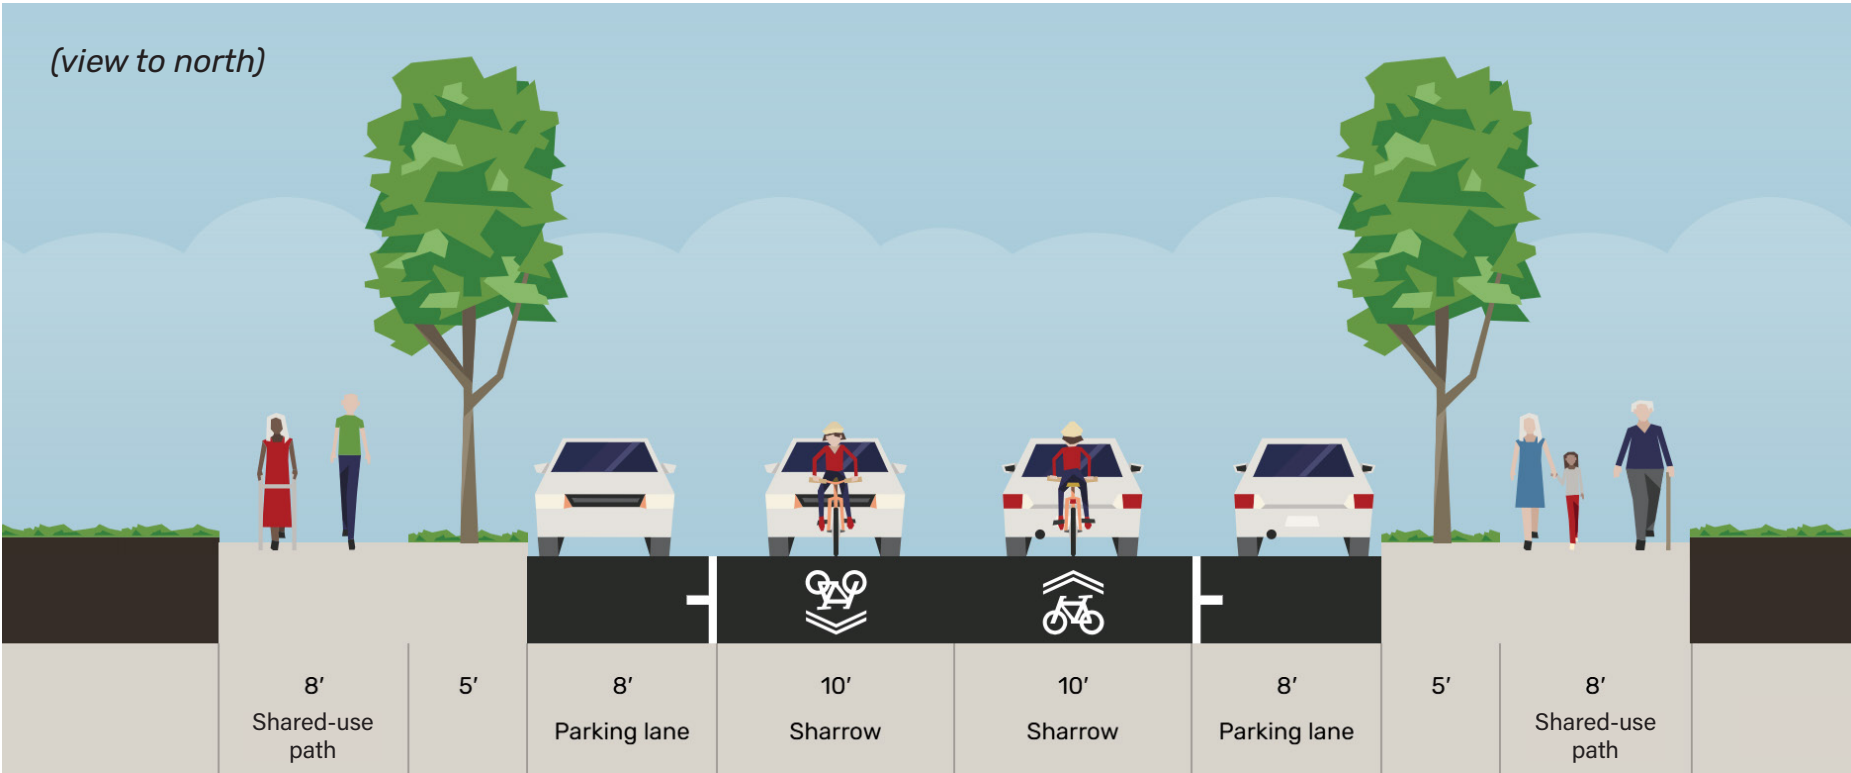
Proposed Typical Cross-Section on North Corinth Street (62' ROW)
